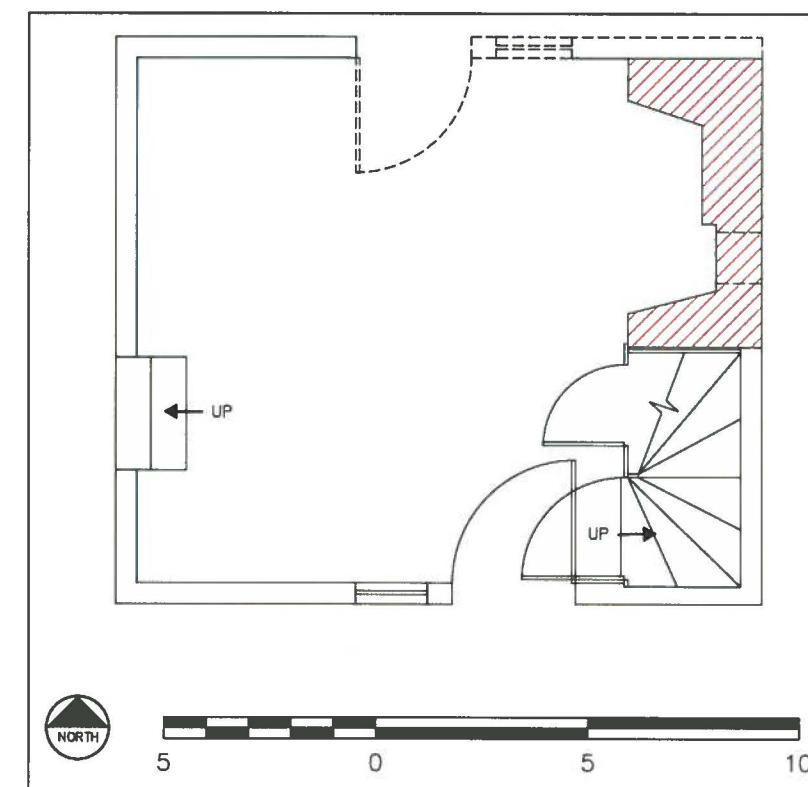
Lambson House Floor Plan, A Small Hall with Garret Put into Service as the Kitchen to the Big House Built 1790.
